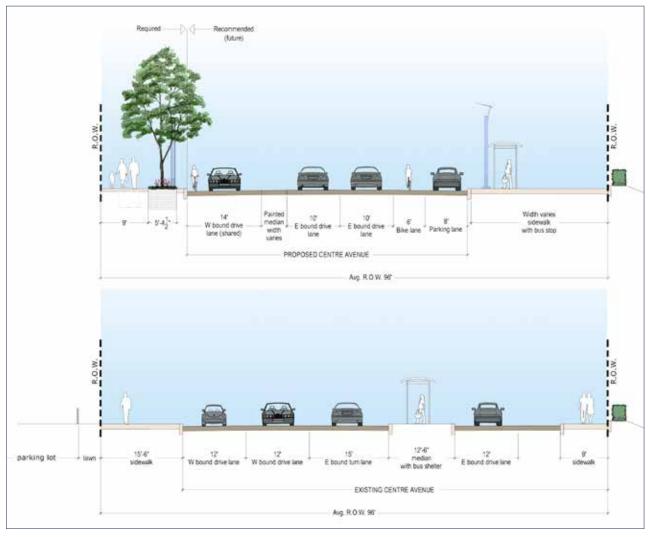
Centre Avenue Section D-D' (at intersection of Centre and Crawford)
